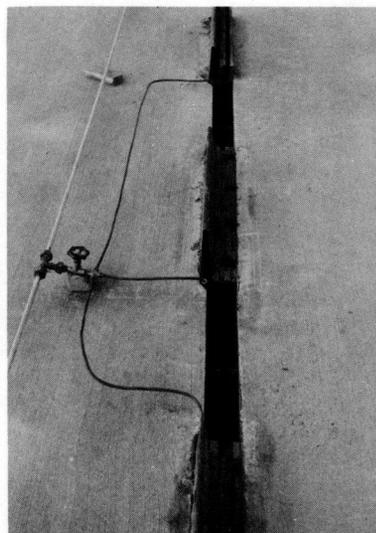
Flat jacks used for post-stressing runway pavement at Maison Blanche. Jacks activated by hydraulic fluid through tubing system from large hydraulic pumps are used in combination with flat steel plates to obtain desired amount of joint opening and slab compression. Round dowels between jacks are used to prevent buckling at joints.
